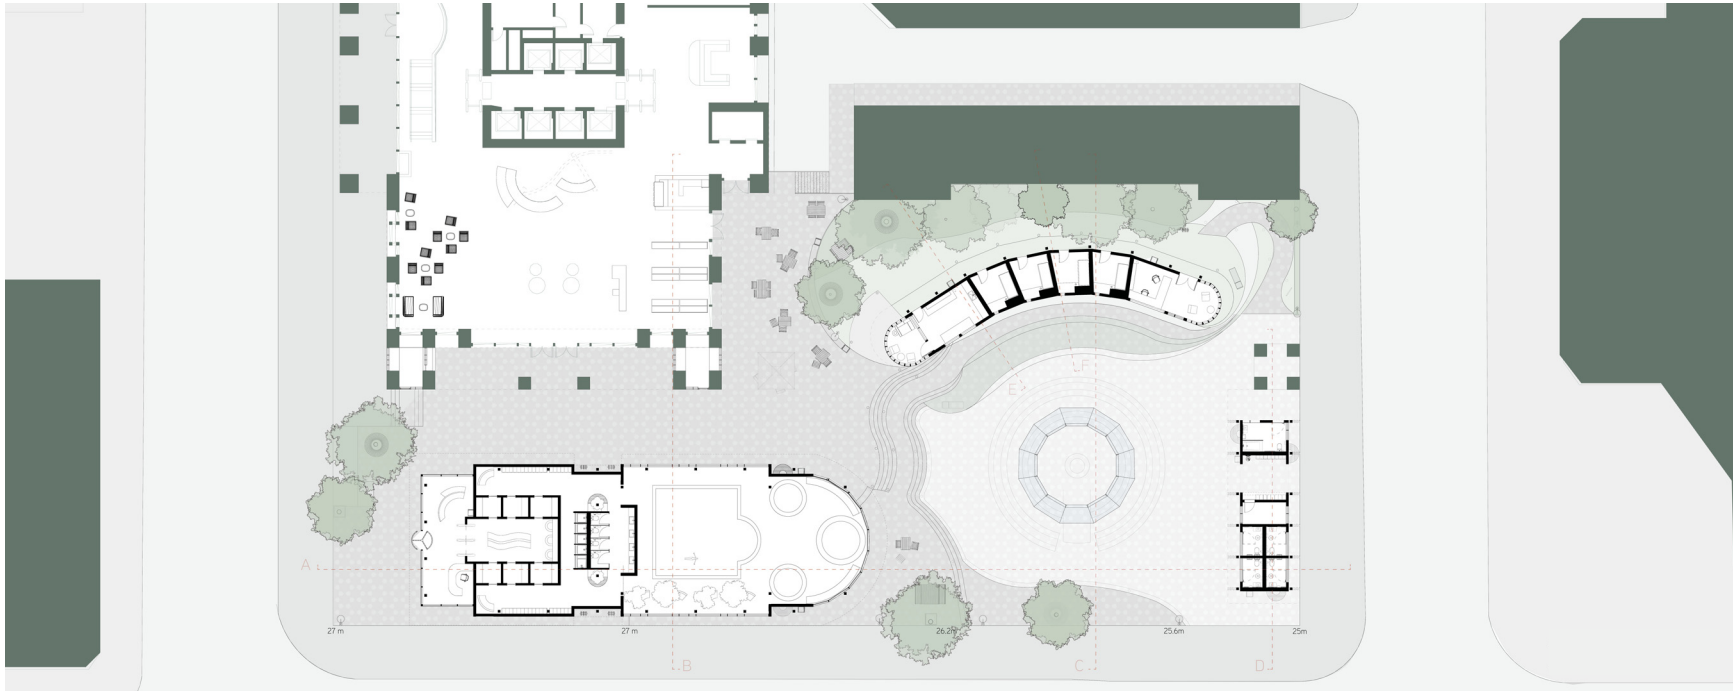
Site Plan showing civic amenity and supportive spaces within the large plaza mixing space.
